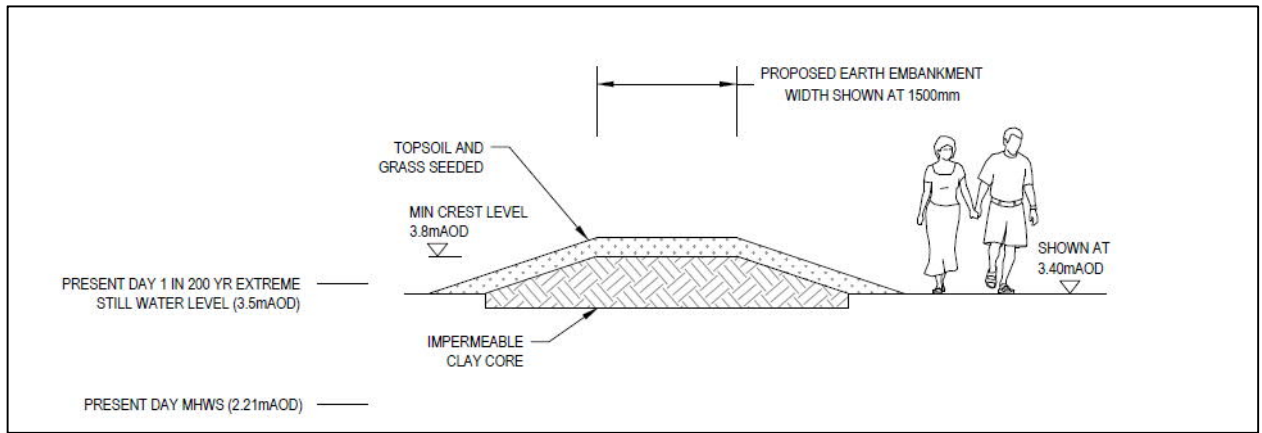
Sketch of indicative earth embankment section (through field) not to scale.
